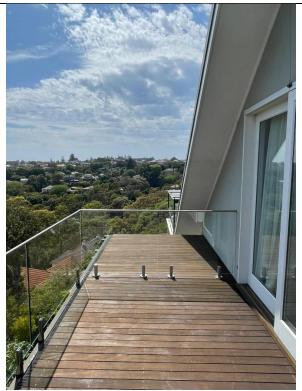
Existing first floor balcony looking toward No.11A Wentworth Ave
